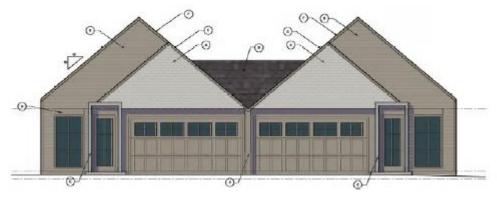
Street elevation (Sundance Dr., Units 1-20)
